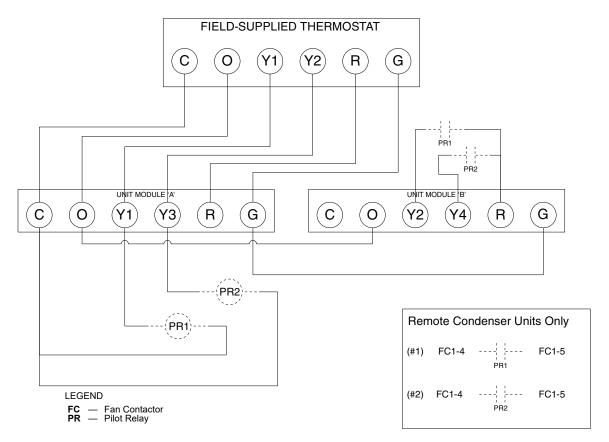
Typical Wiring 40 to 60 Ton Units (Two-Stage Cooling)
